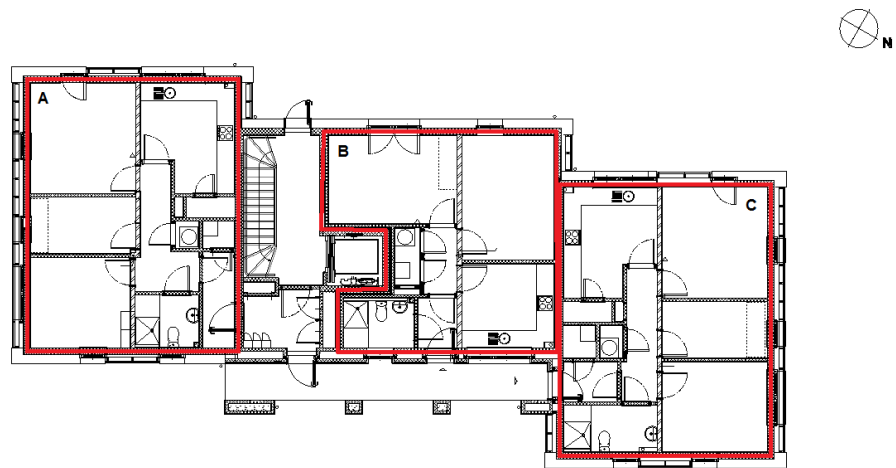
GROUND FLOOR OF BLOCK 2 AT KNIGHTS PLACE. THERE ARE TWO MORE SIMILAR FLOORS ABOVE, WITH EACH FLOOR COMPRISING OF THREE FLATS (A & C ARE TWO-BEDROOM FLAT, B IS A SINGLE BEDROOM FLAT) AND THE COMMUNAL ENTRANCE WAY. ADAPTED FROM PLAN BY GALE & SNOWDEN ARCHITECTS.
